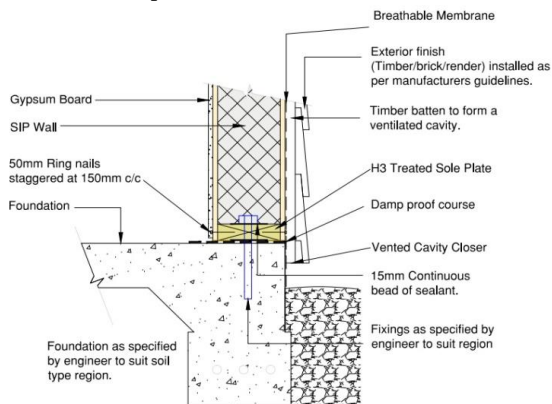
Detail of a Structural Insulated Panel Wall Section.
